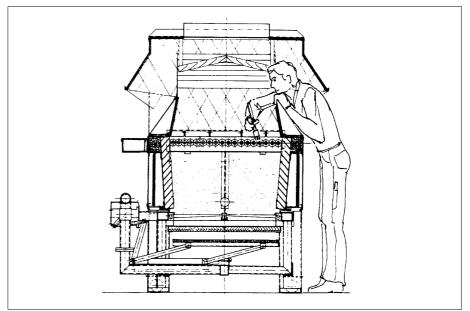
Inspection and cleaning of the draught diverter and heat exchanger
